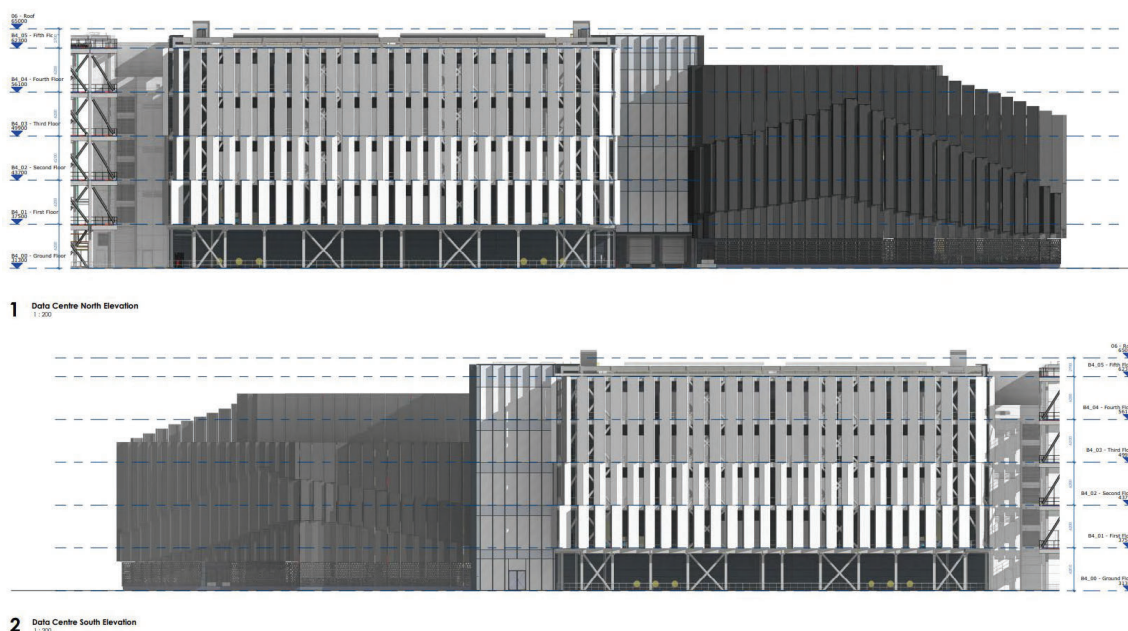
Proposed Elevations (please note – a larger version of plan can be found in the Committee Plan Pack)
